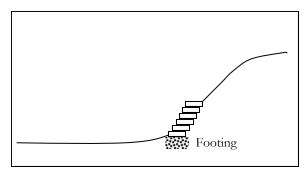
B. Stacking of dry blocks requires successive stair stepping into the hillside to maintain integrity. Method allows for minimal slope cutting and is best utilized for stabilizing the "toe" of a slope.
